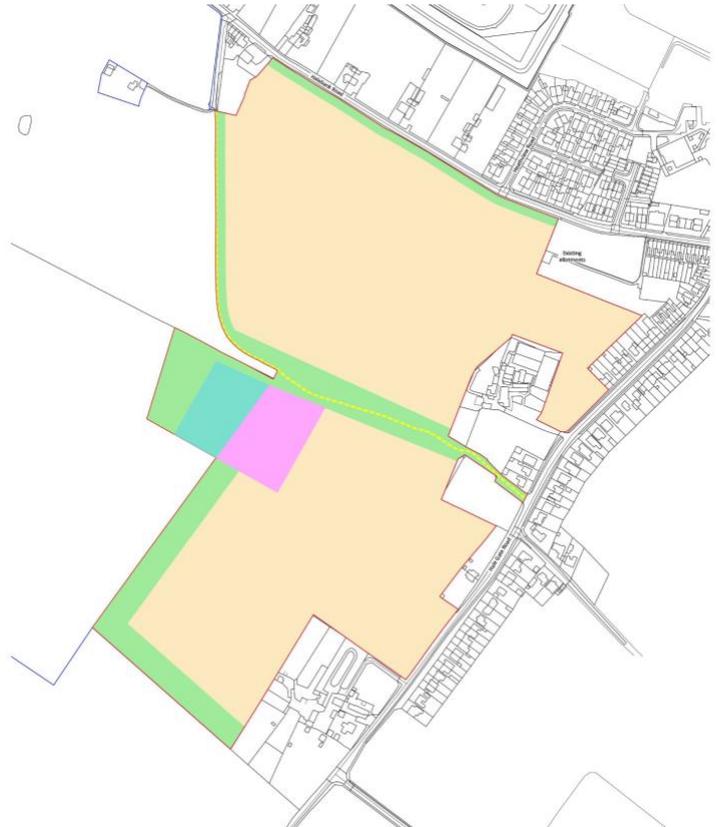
Revised Parameter Plan with isolated, inaccessible and unfunctional open space which also encroaches into the Green Belt (source: halton.gov.uk)
